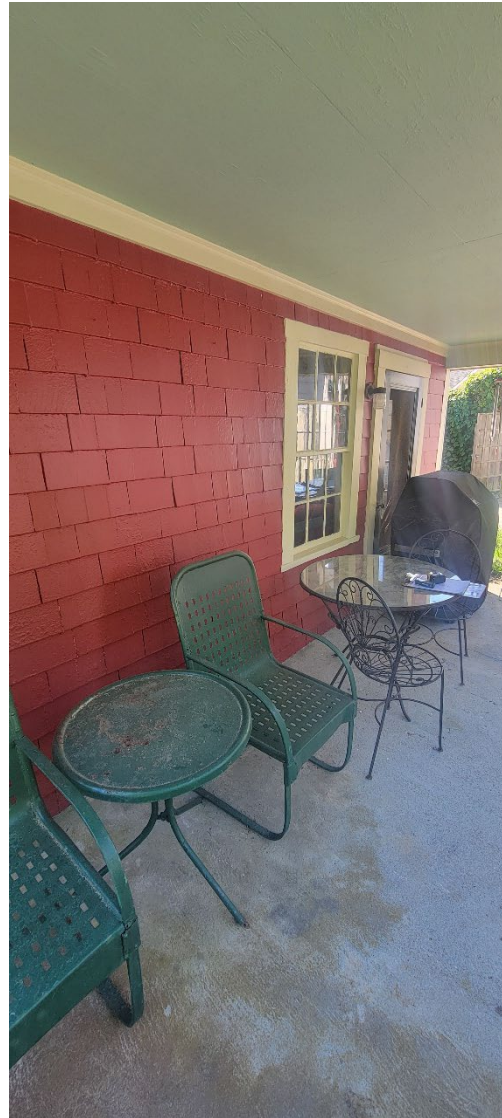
P 453 cedar siding, window and door below covered porch (concrete floor)
